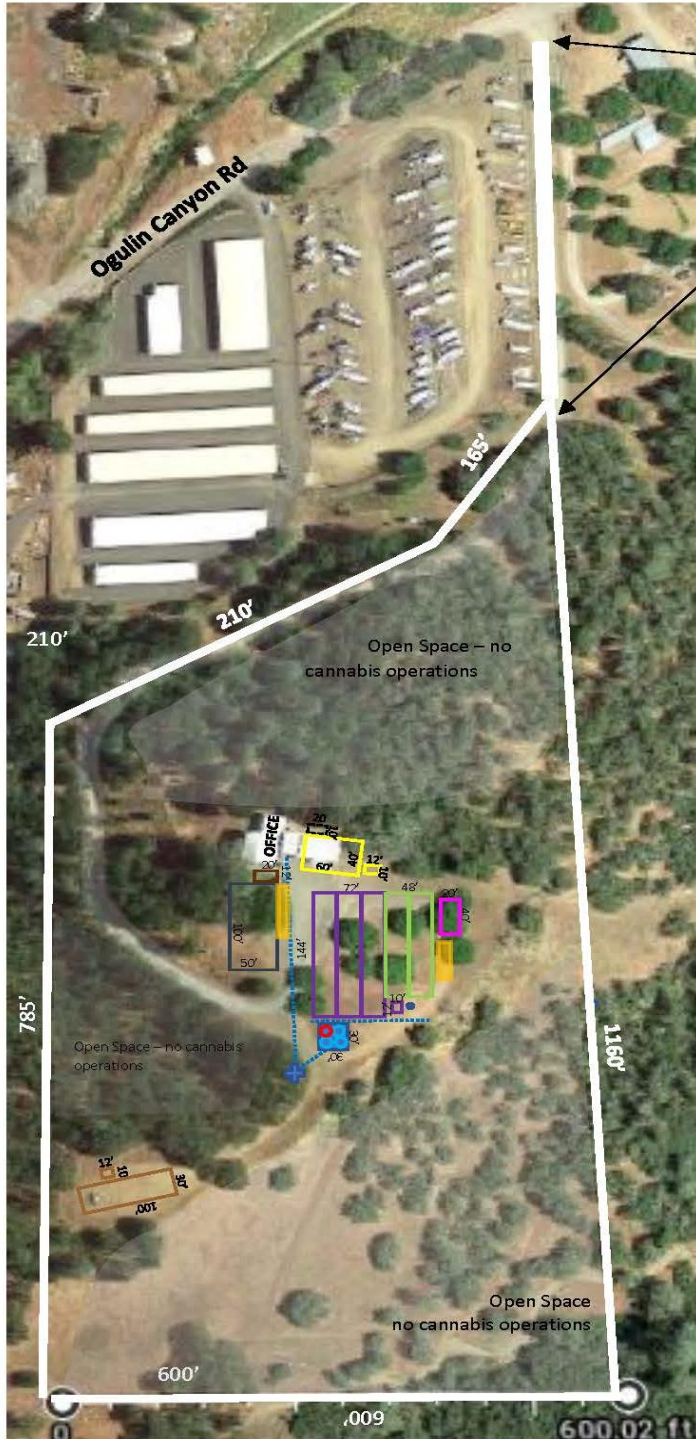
Site Plan Diagram Full Detail with Delivery Only Retail
